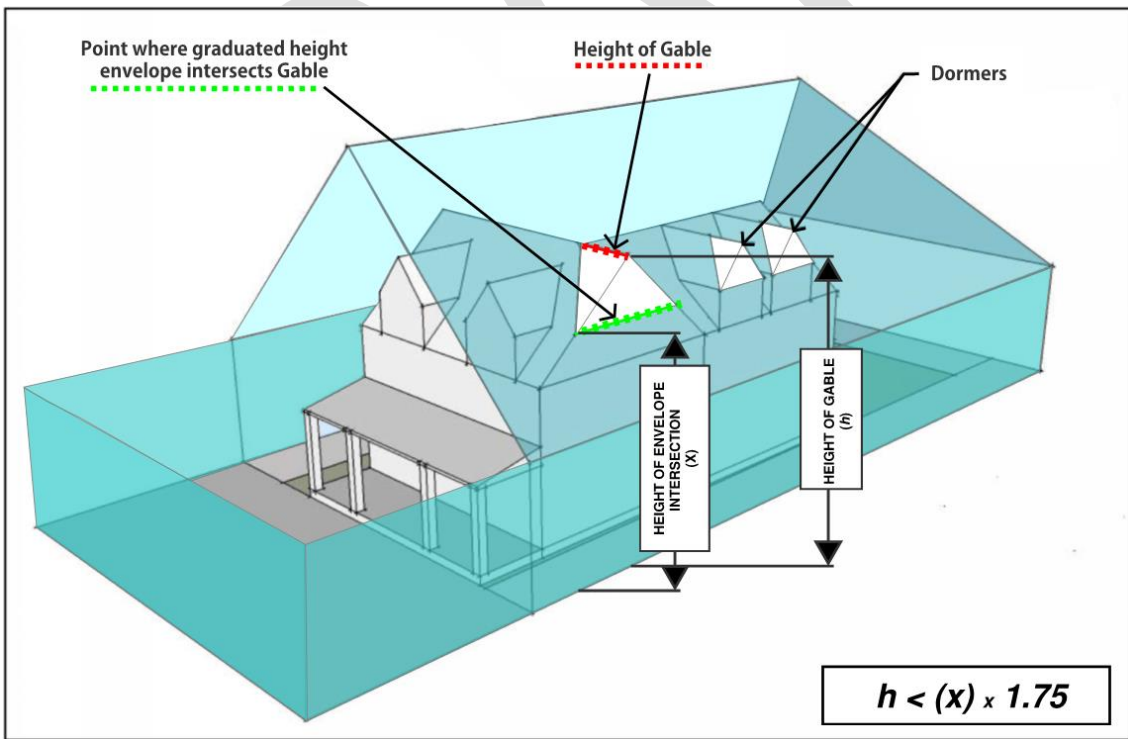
XX.7 Gable projecting beyond building height envelope exception
